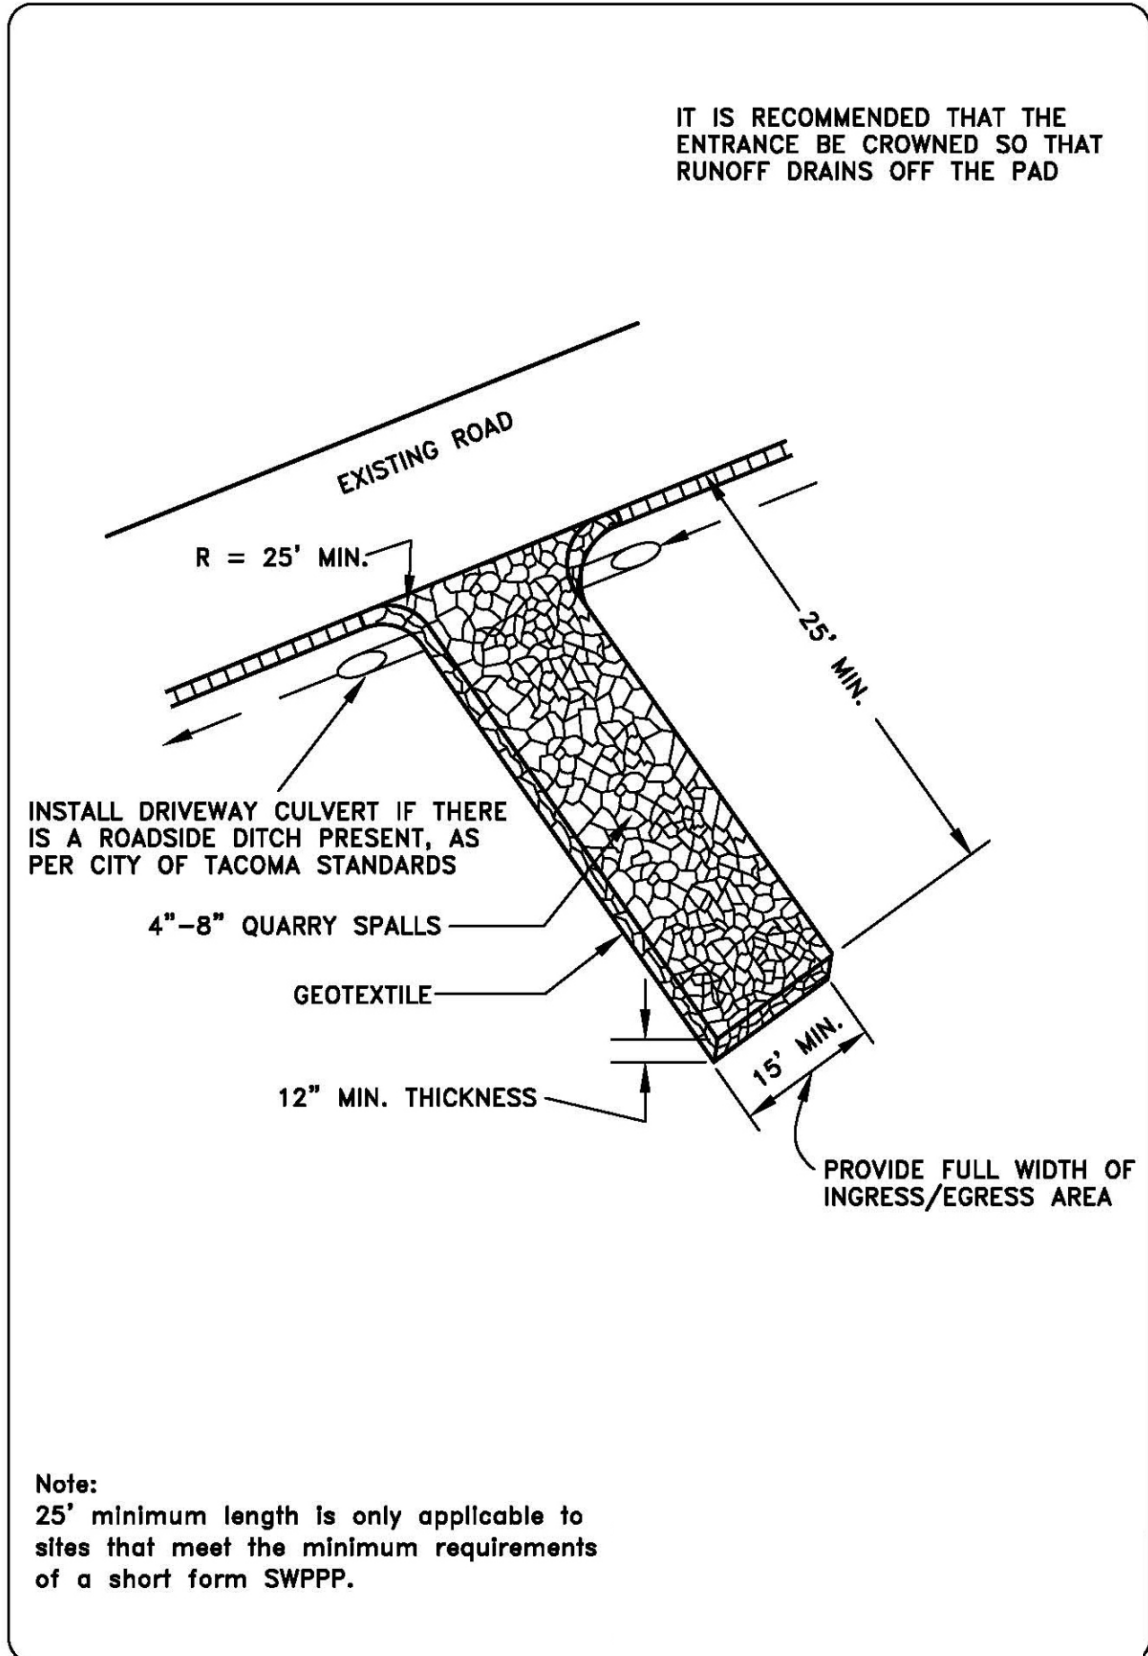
2. Small-Site Stabilized Construction Entrance
